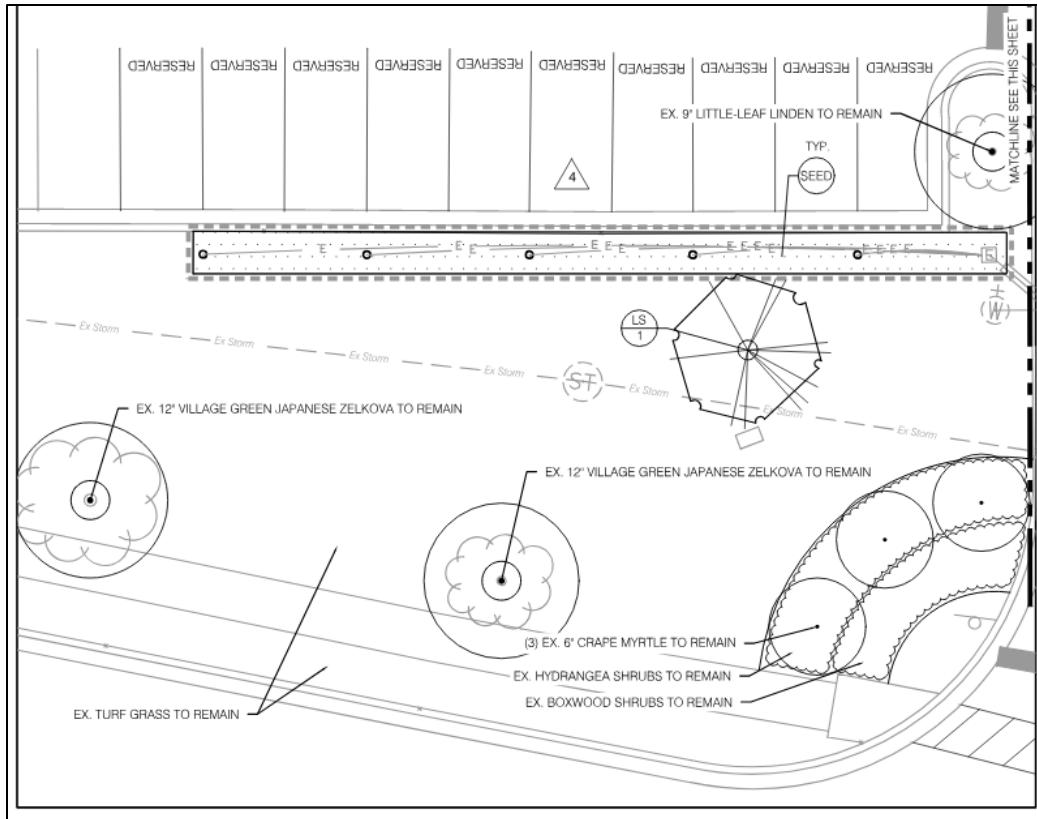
Plan View of Figure 10 and proposed Electric Vehicle charging spaces
